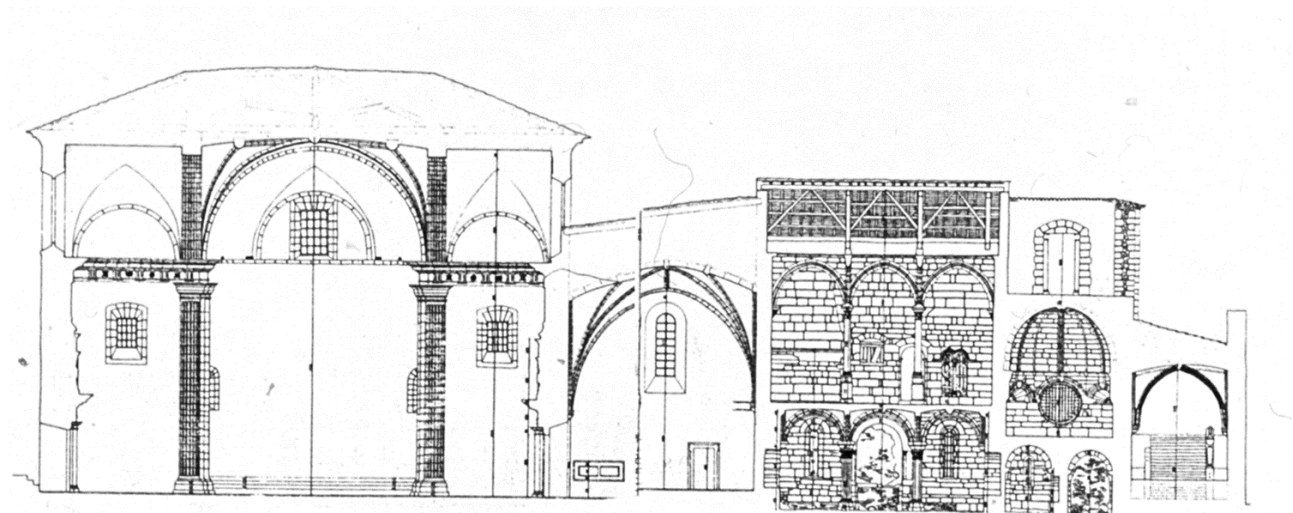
Section survey. Transversal section of the church of Santa María de Carracedo Monastery in Carracedo, León (Spain). Section by Salvador P. Arroyo and Susana Mora.
